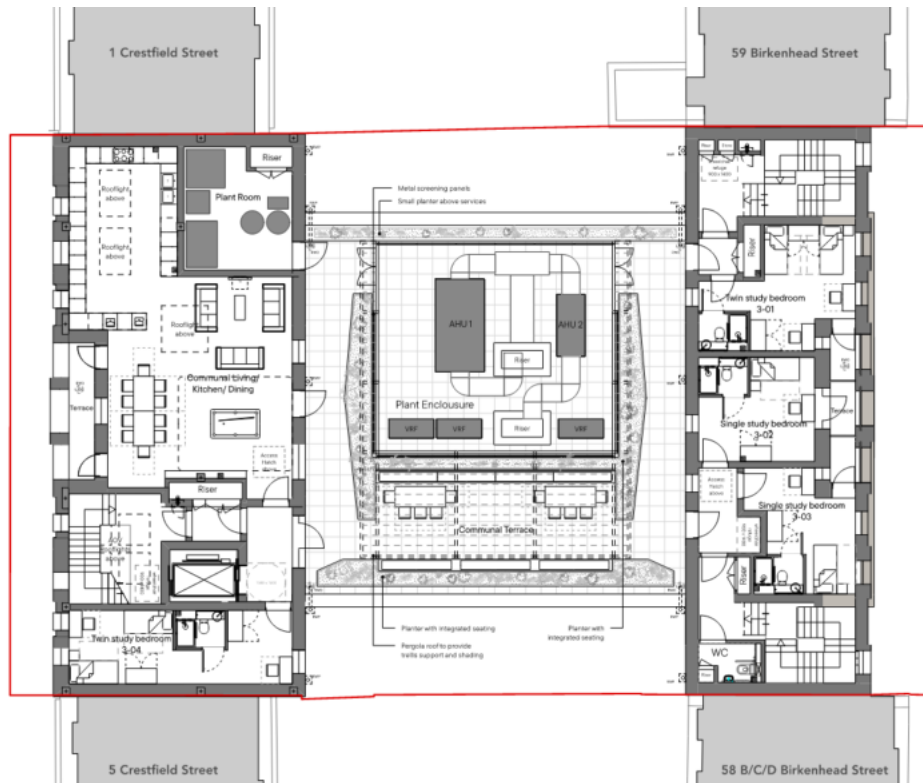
Proposed third floor plan showing the relationship between the new roof extensions and the building line of neighbouring properties.
